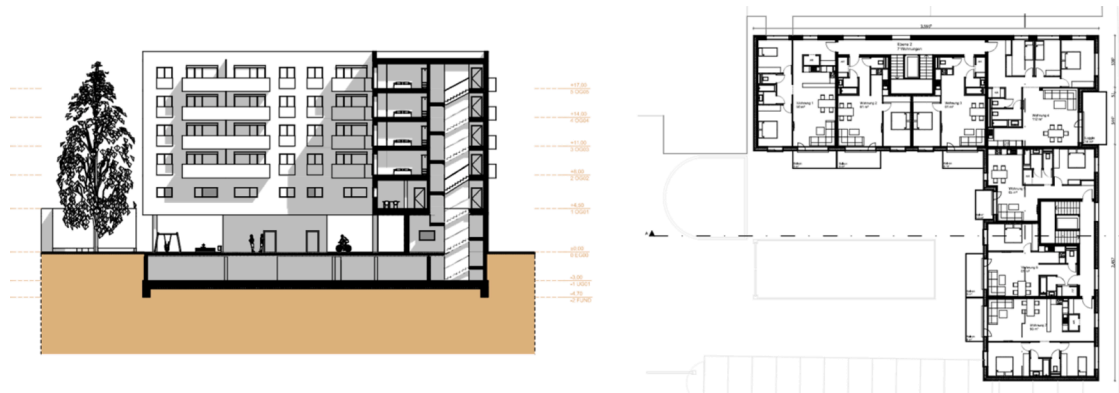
Layouts of the building: sectional view (left) and floor plan (right).
